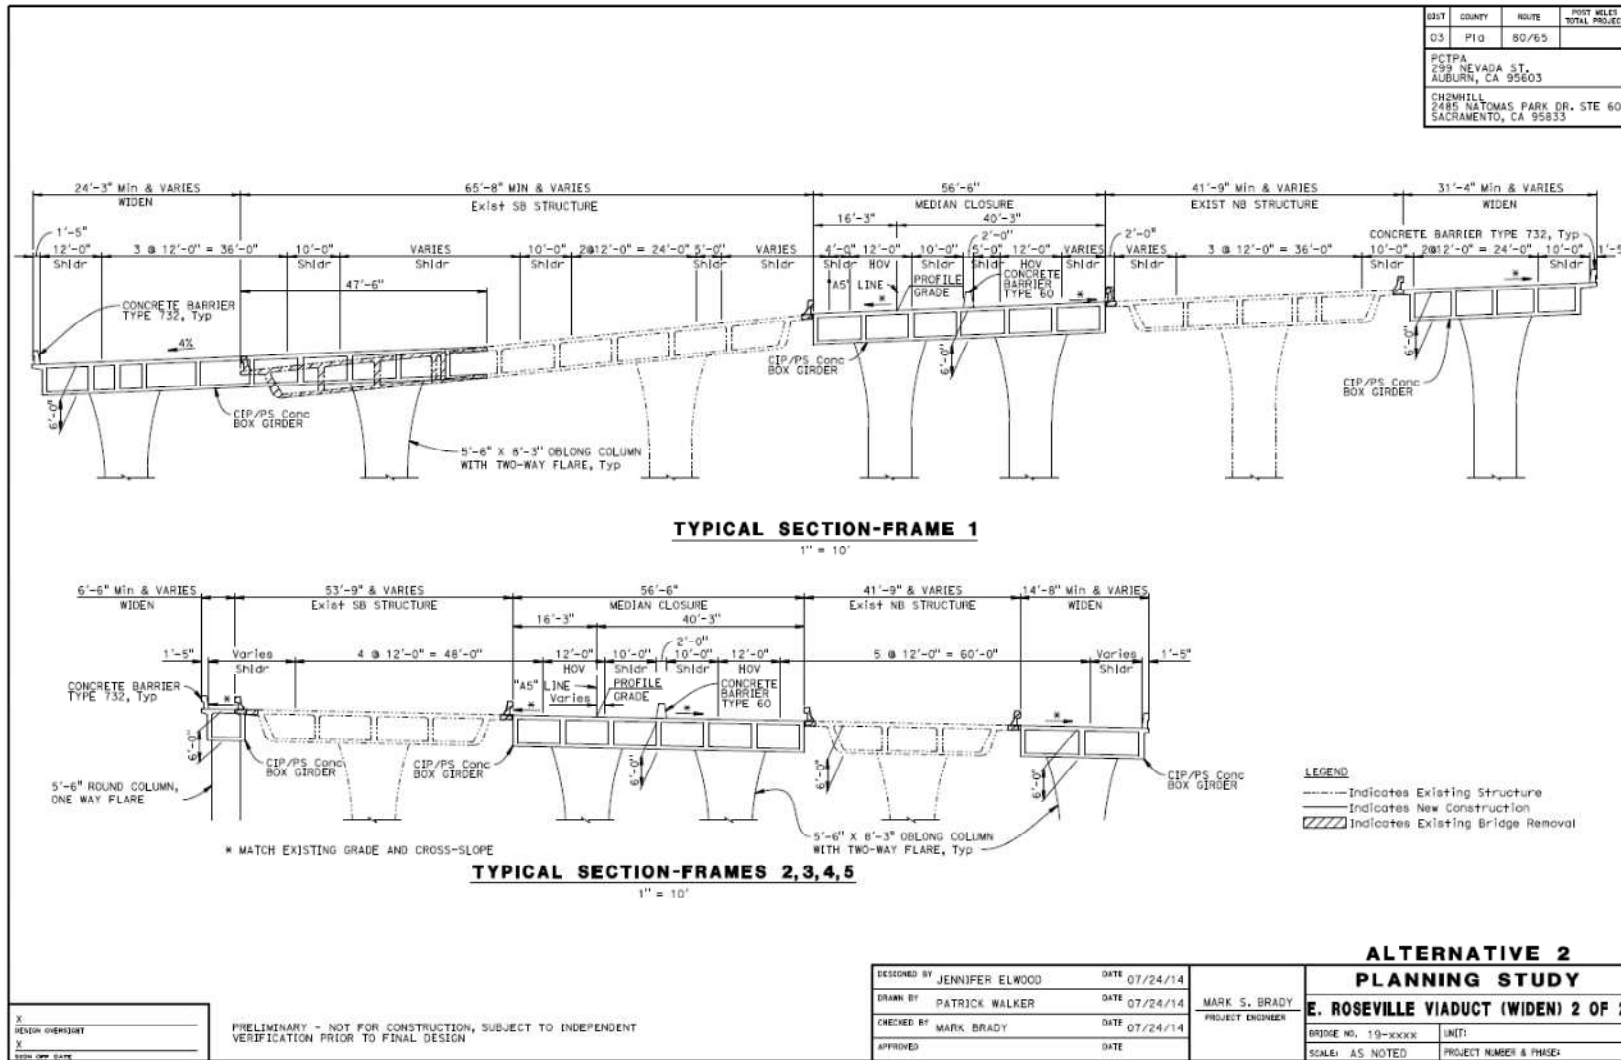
East Roseville Viaduct Proposed Bridge Plan (Alternative 2) (2 of 2)
